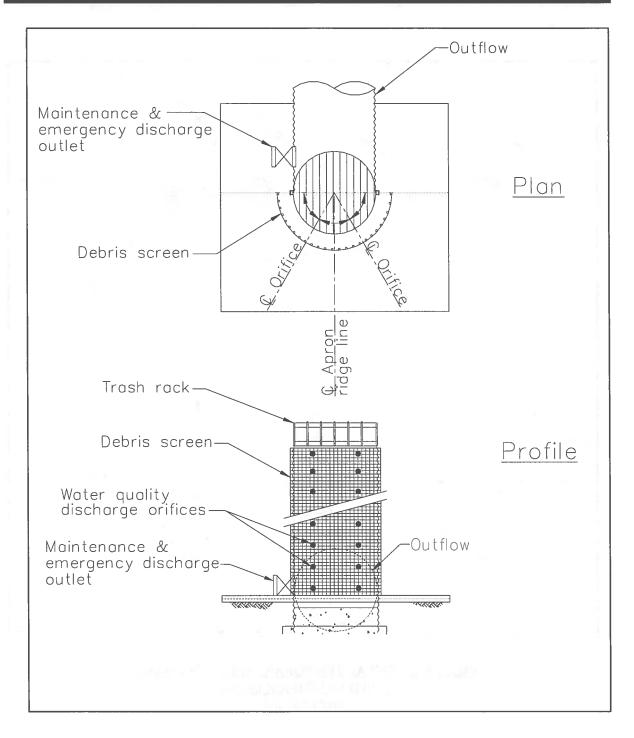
MULTIPLE ORIFICE OUTLET RISER NOT TO SCALE
